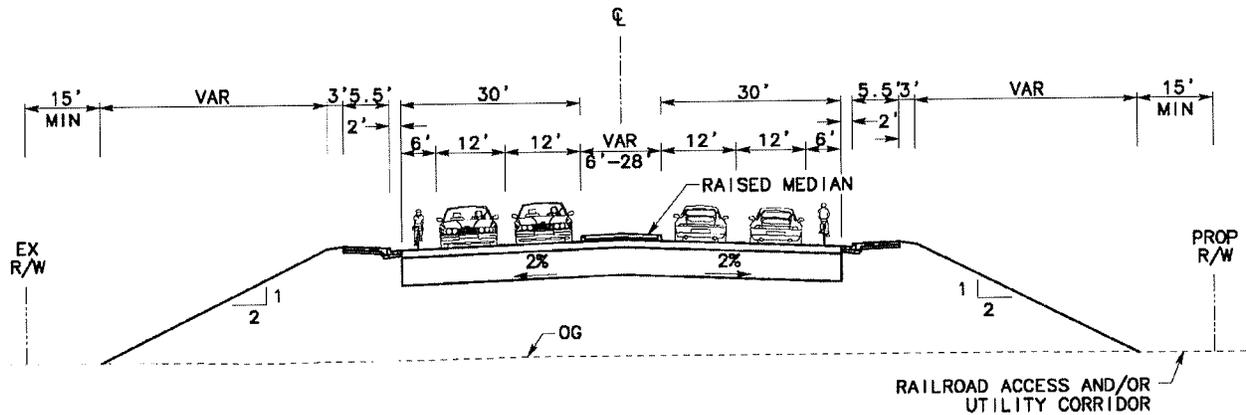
Alternative 1 – Overhead with Side Slopes (Looking East)
